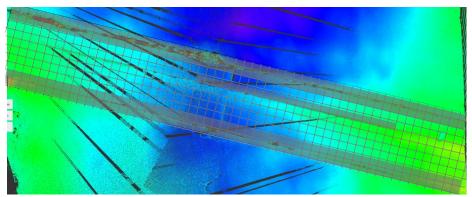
Structure 0954163 - Deteriorated areas of the West joint.
